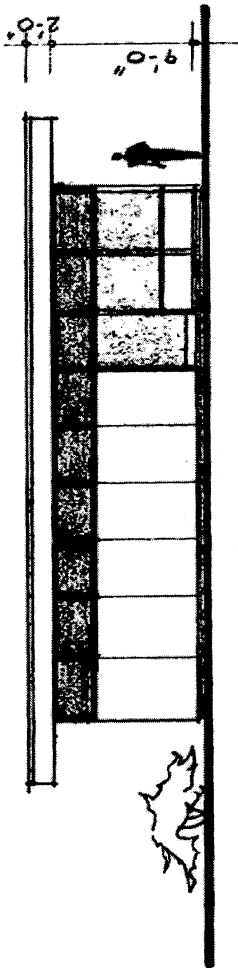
Plan and Elevation for the Proposed Electric Generator Building
